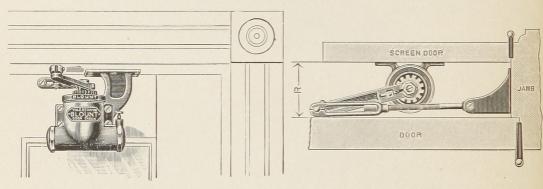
Right-hand Door From Outside Use Left-hand Check Soffit Bracket, additional (see page 185)
